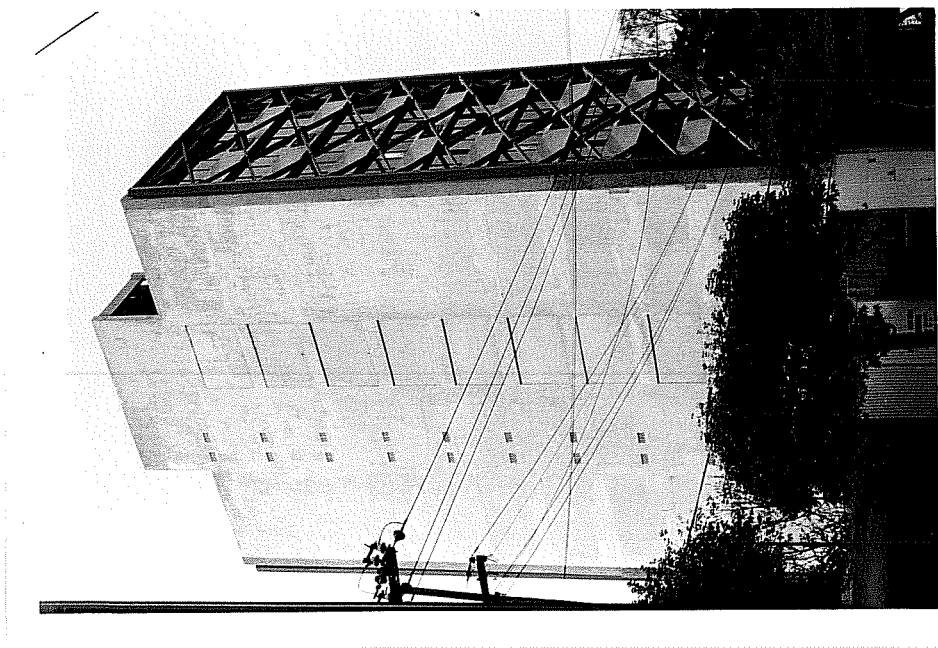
Durango 49, Mexico City; steel bracing retrofitting
